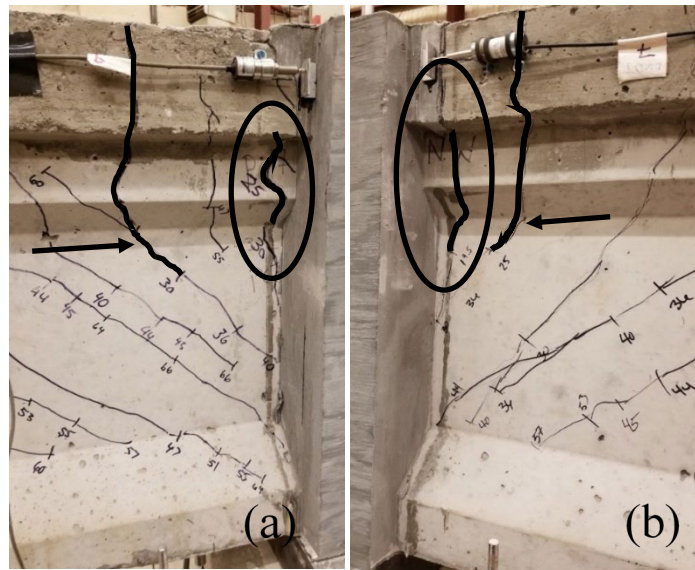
Initial flexural cracking on the RC2-N girder at 25 kips of load and initial flexure-shear cracking on the RC2-N girder at 30 kips of load (a) and initial flexural cracking on the RC2-S girder at 19.5 kips of load and flexure-shear cracking on the RC2-S girder at 25 kips of load (b). Dark ovals show the initial flexural cracking near the continuity joint and arrows point to the dark lines that indicate the initial flexure-shear cracking.
